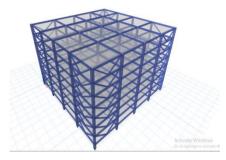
G+6 Building with V-Bracing on Outer peripheral Corners
